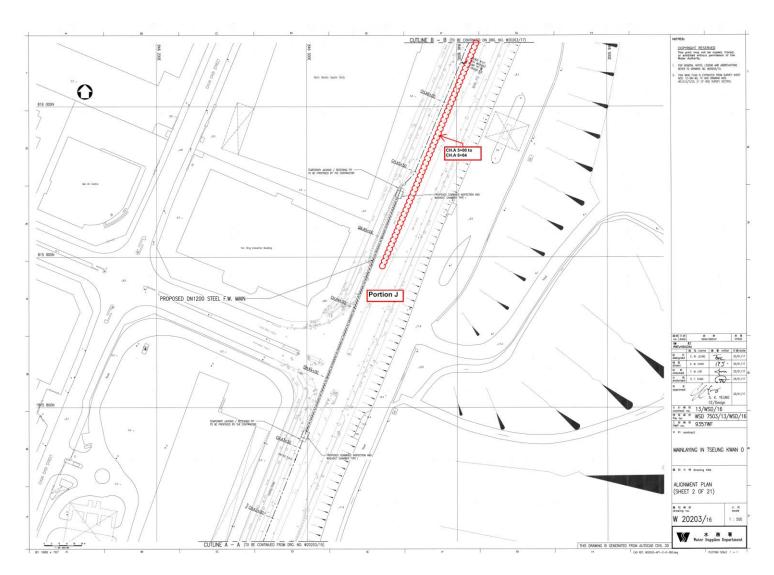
Location Plan for Portion J - CH.A 5+00 to CH.A 6+64
